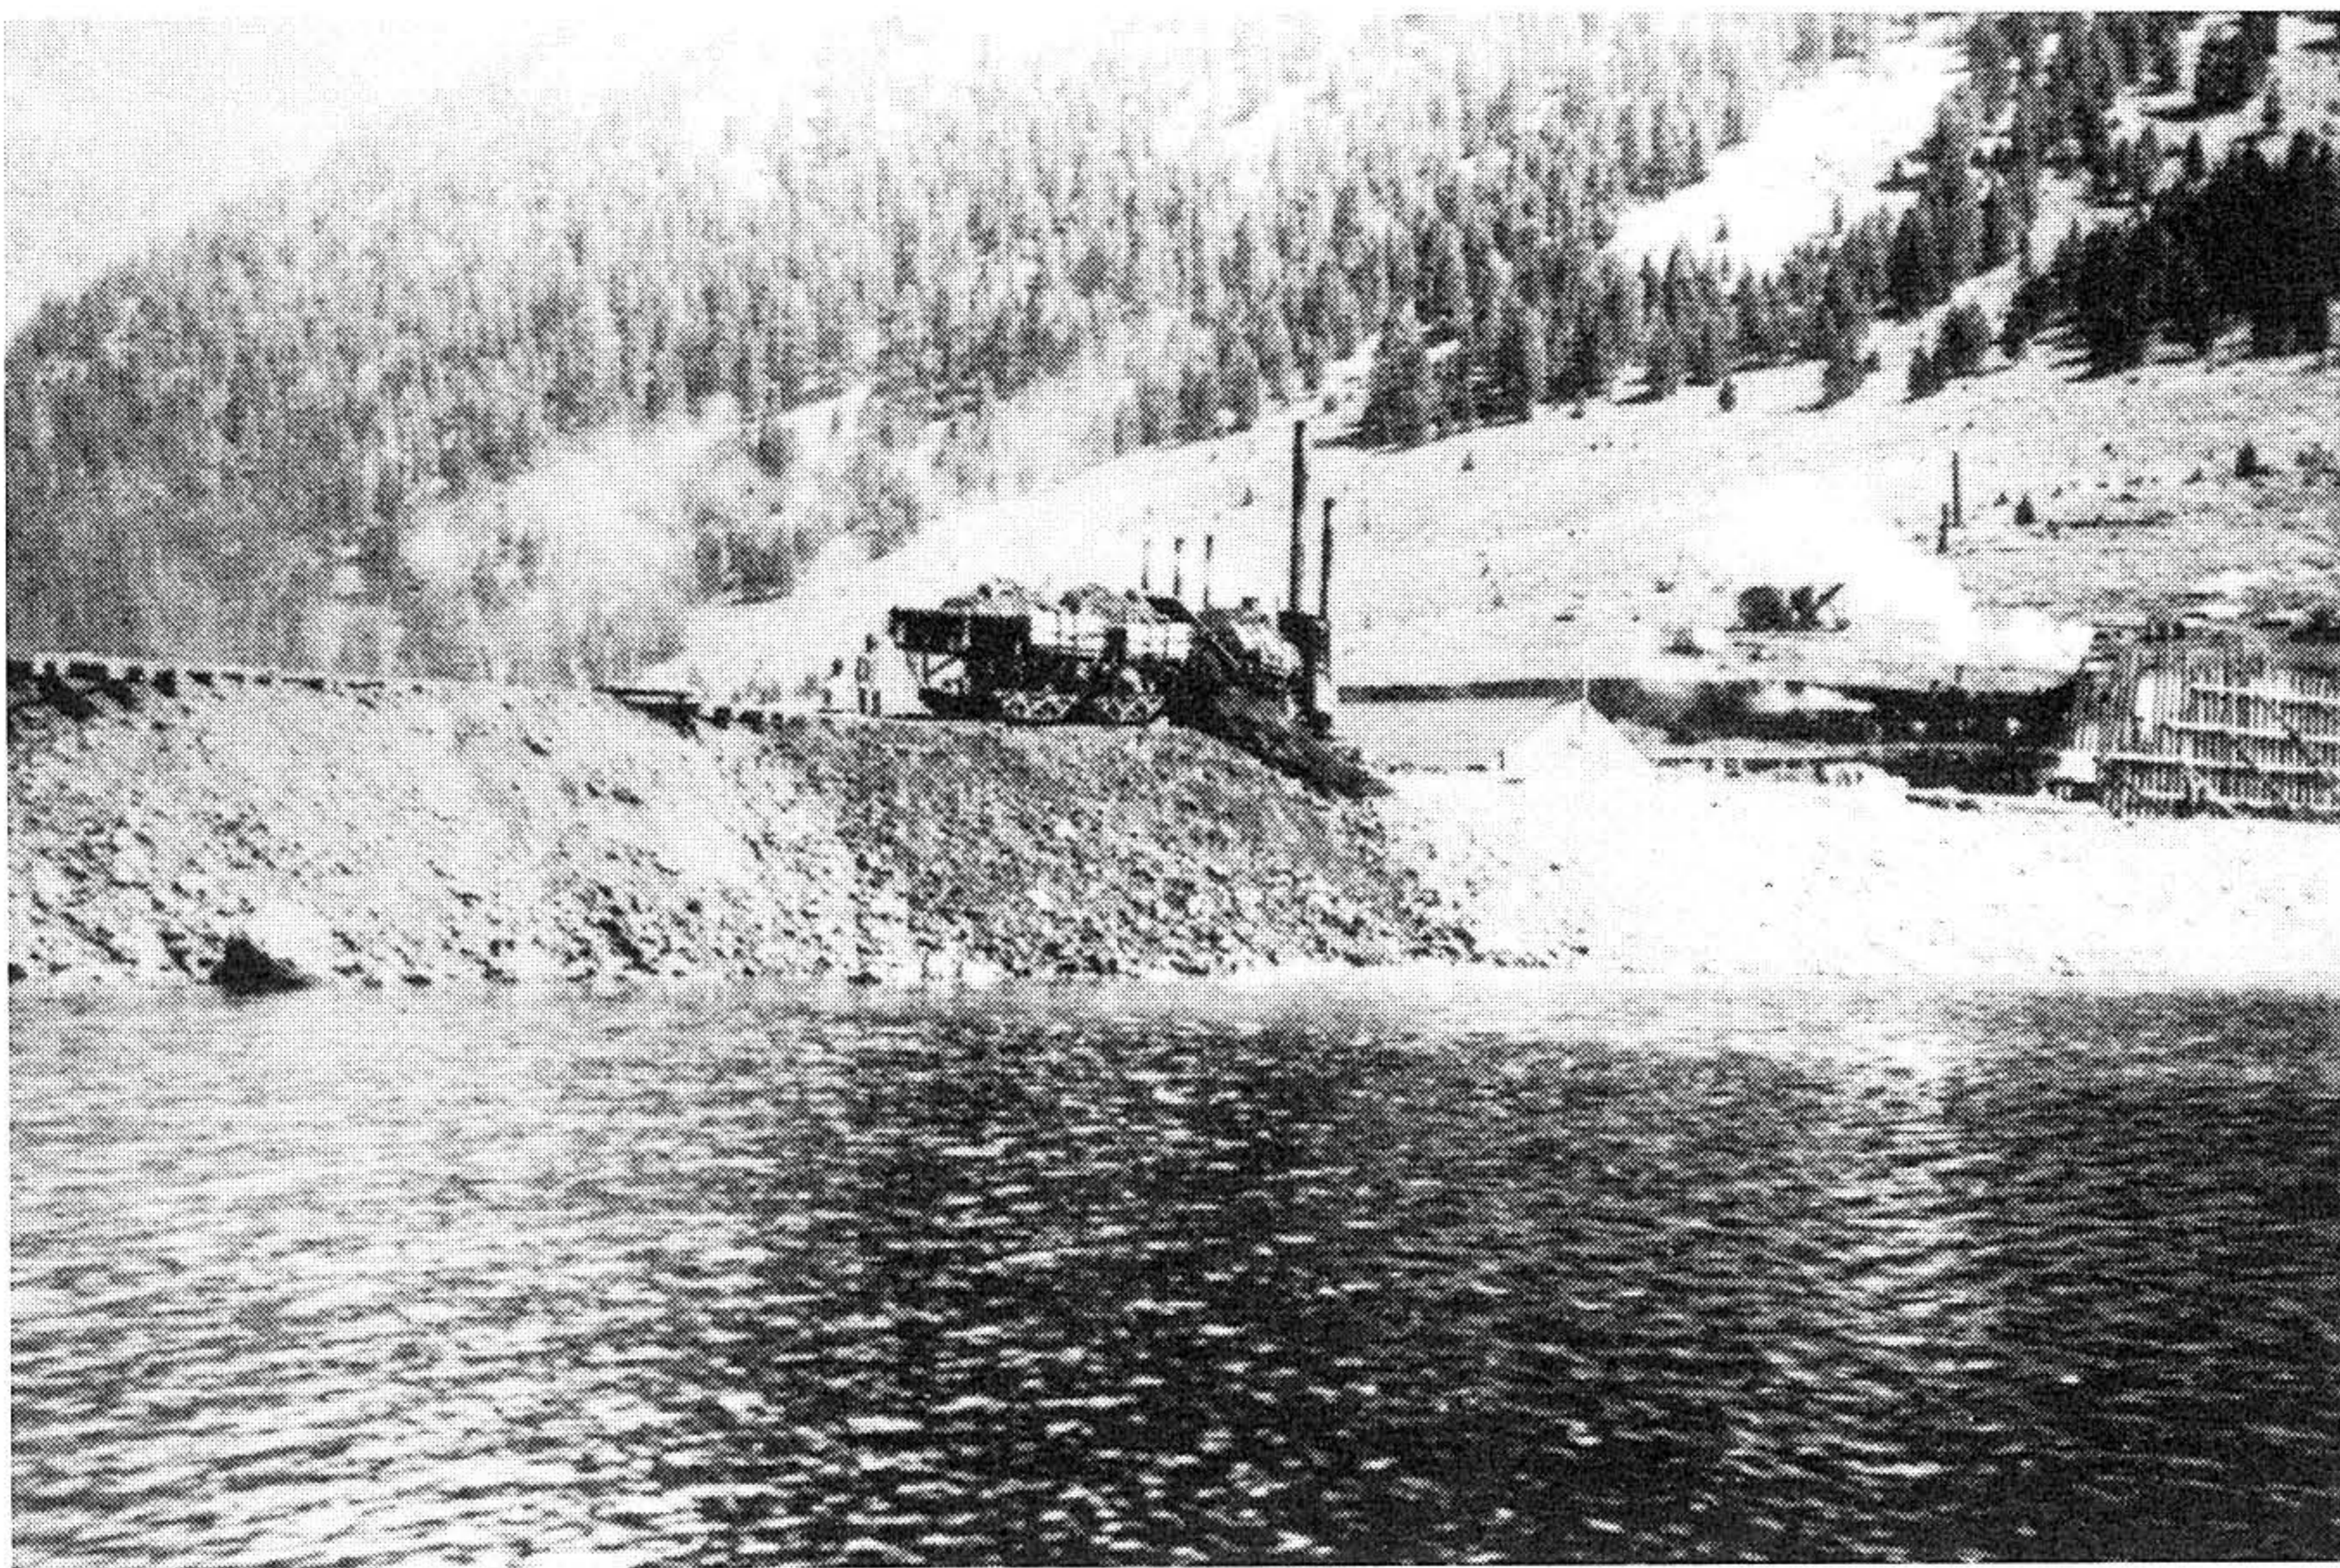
Photograph taken in 1915 during construction of Hebgen Dam in Montana. Note how rock fill is being loosed from side-dumping rail cars into the reservoir pool. Formwork for the concrete core wall can be seen at the far right. This embankment subsequently settled up to 5.3 ft against the core wall during the magnitude 7.5 West Montana earthquake in August 1959 (Sherrard, 1959; James and Kiersch, 1991).
